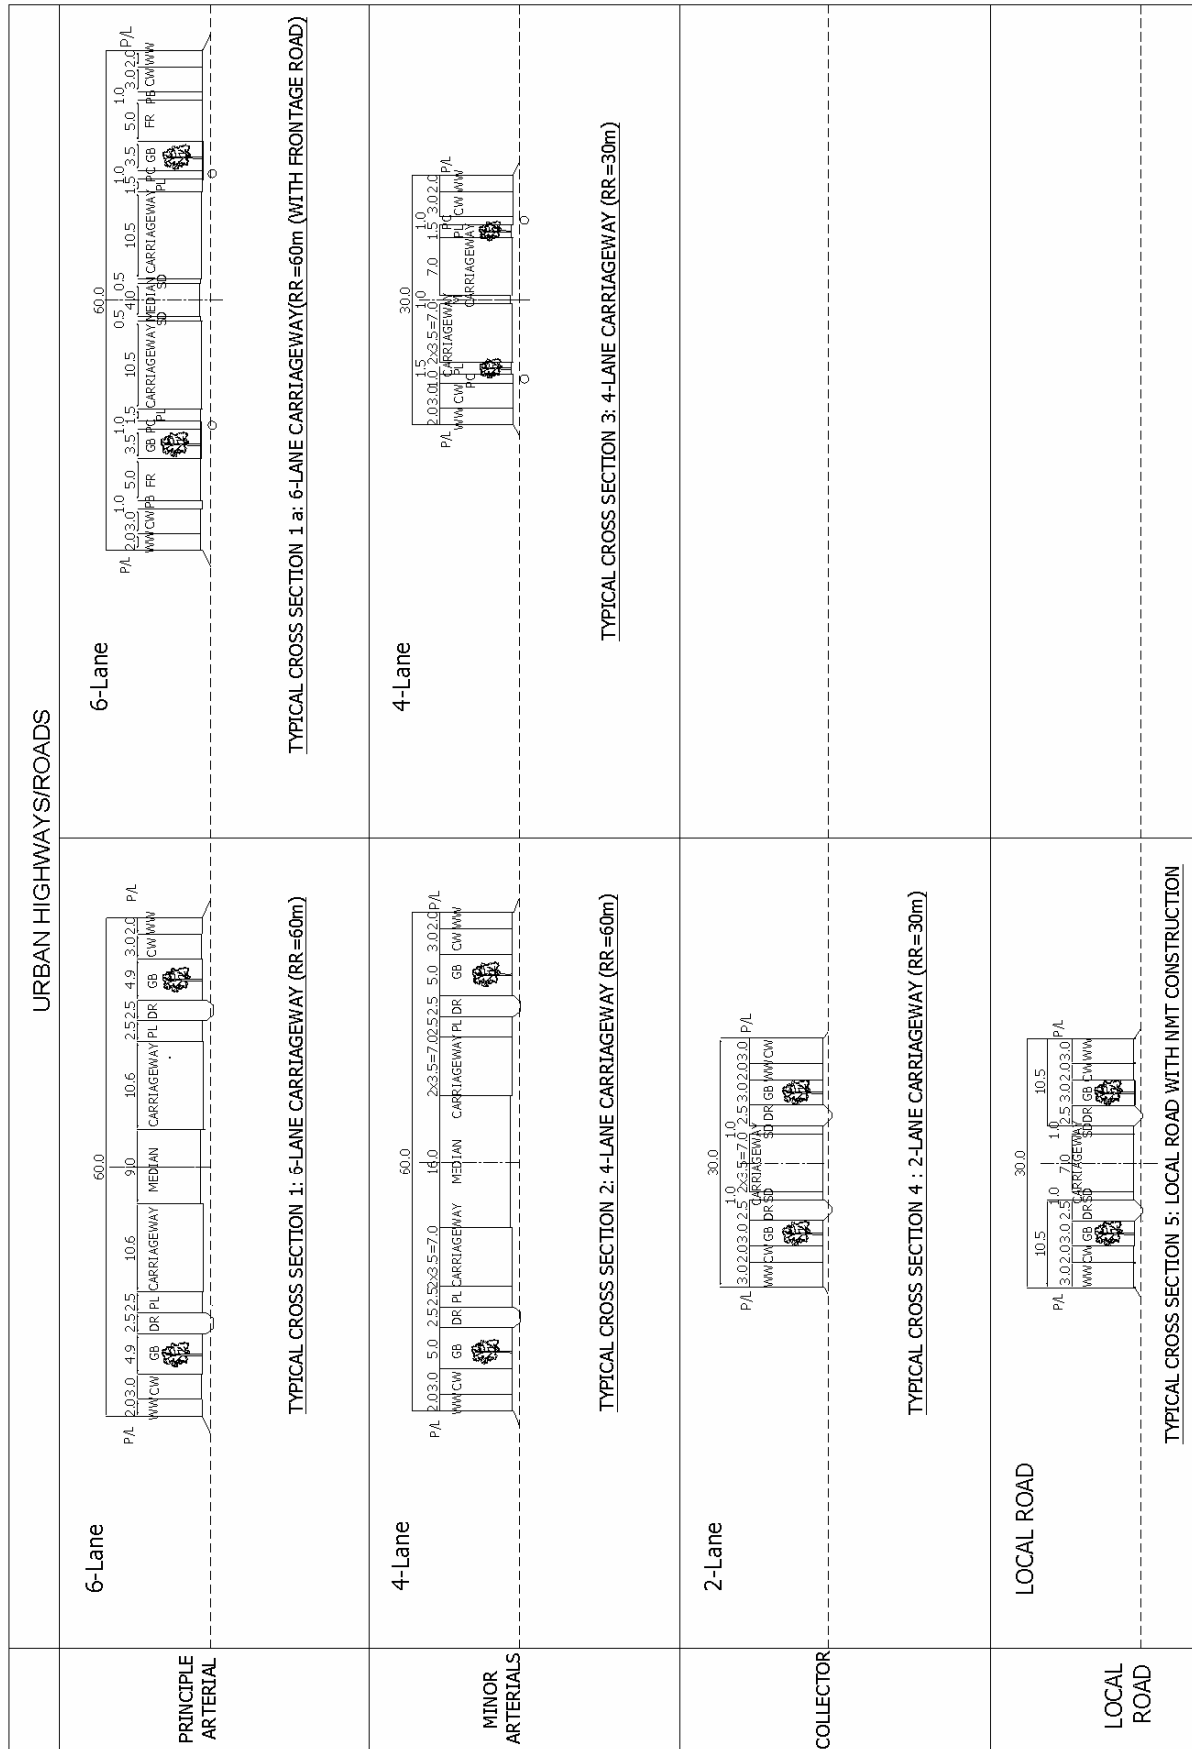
PROPOSED STANDARD CROSS SECTION
